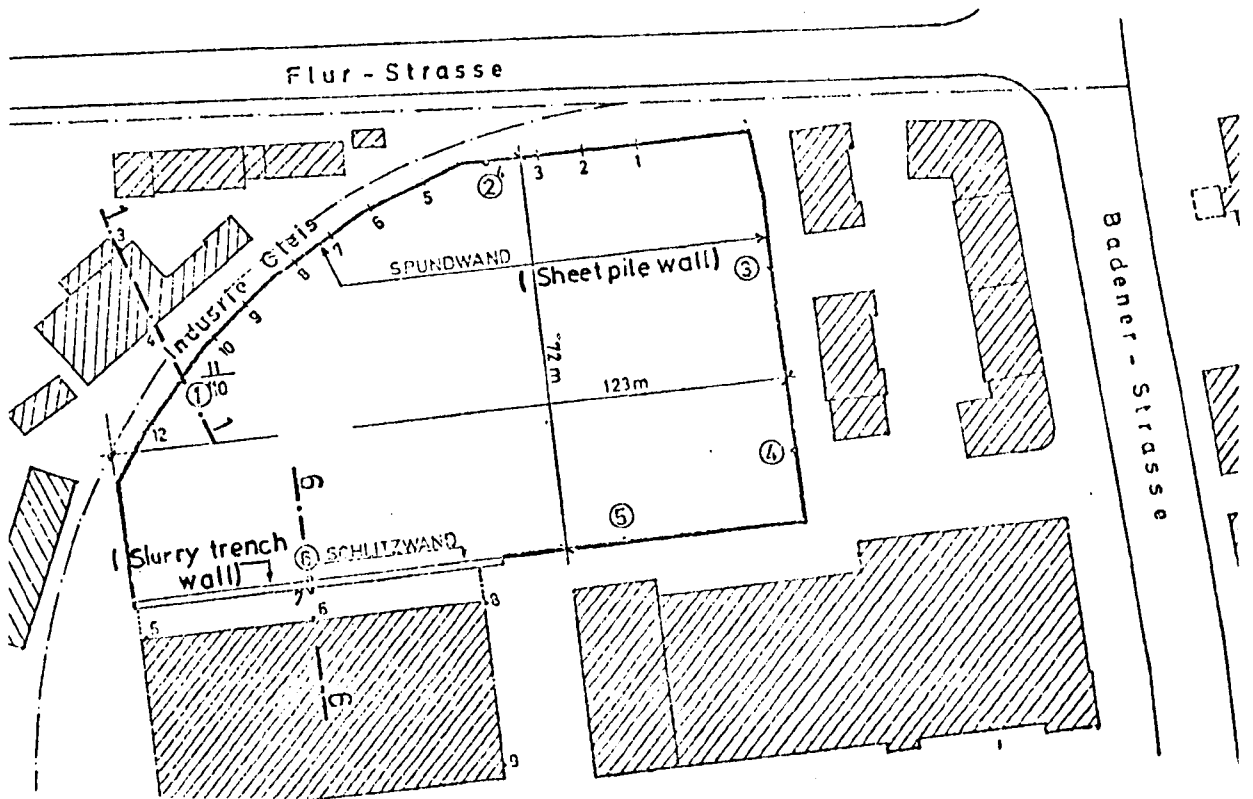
SITE PLAN (After Henauer and Otta, 1976)
